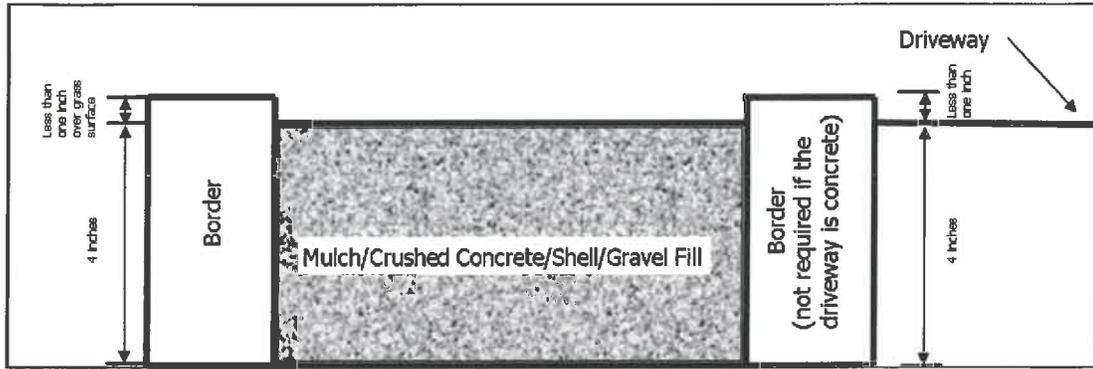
Figure E: Design Standard for Driveways and Accessory Parking Spaces with Mulch, Crushed Concrete, Shell or Gravel Fill
